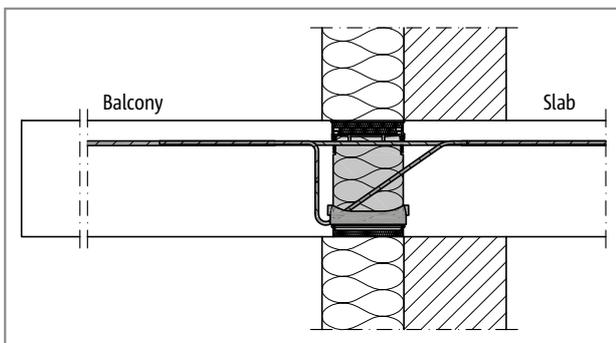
Schöck Isokorb® XT type K: Connection with thermal insulation composite system (TICS)
